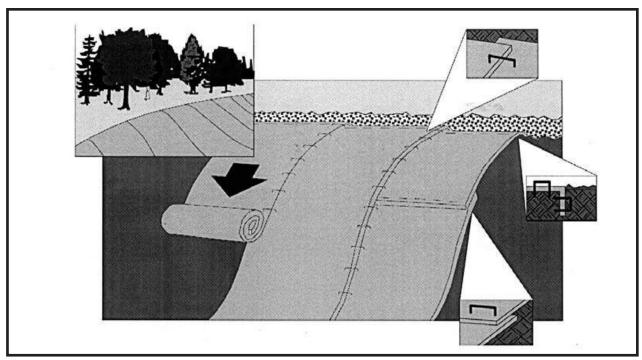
Typical installation of erosion control blankets on a slope - Consult manufacturer for recommendations on proper installation of staple patterns, overlap and keying edges.
